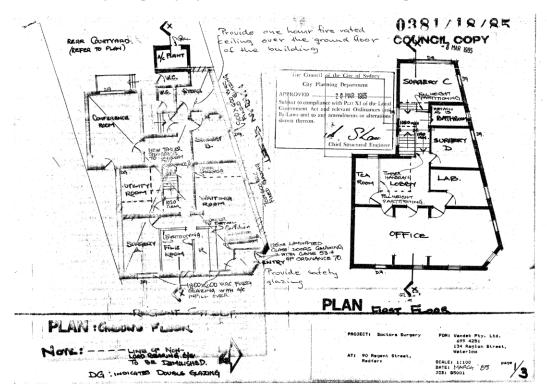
Plans depicting the proposed renovations to the building in 1985.²⁵
